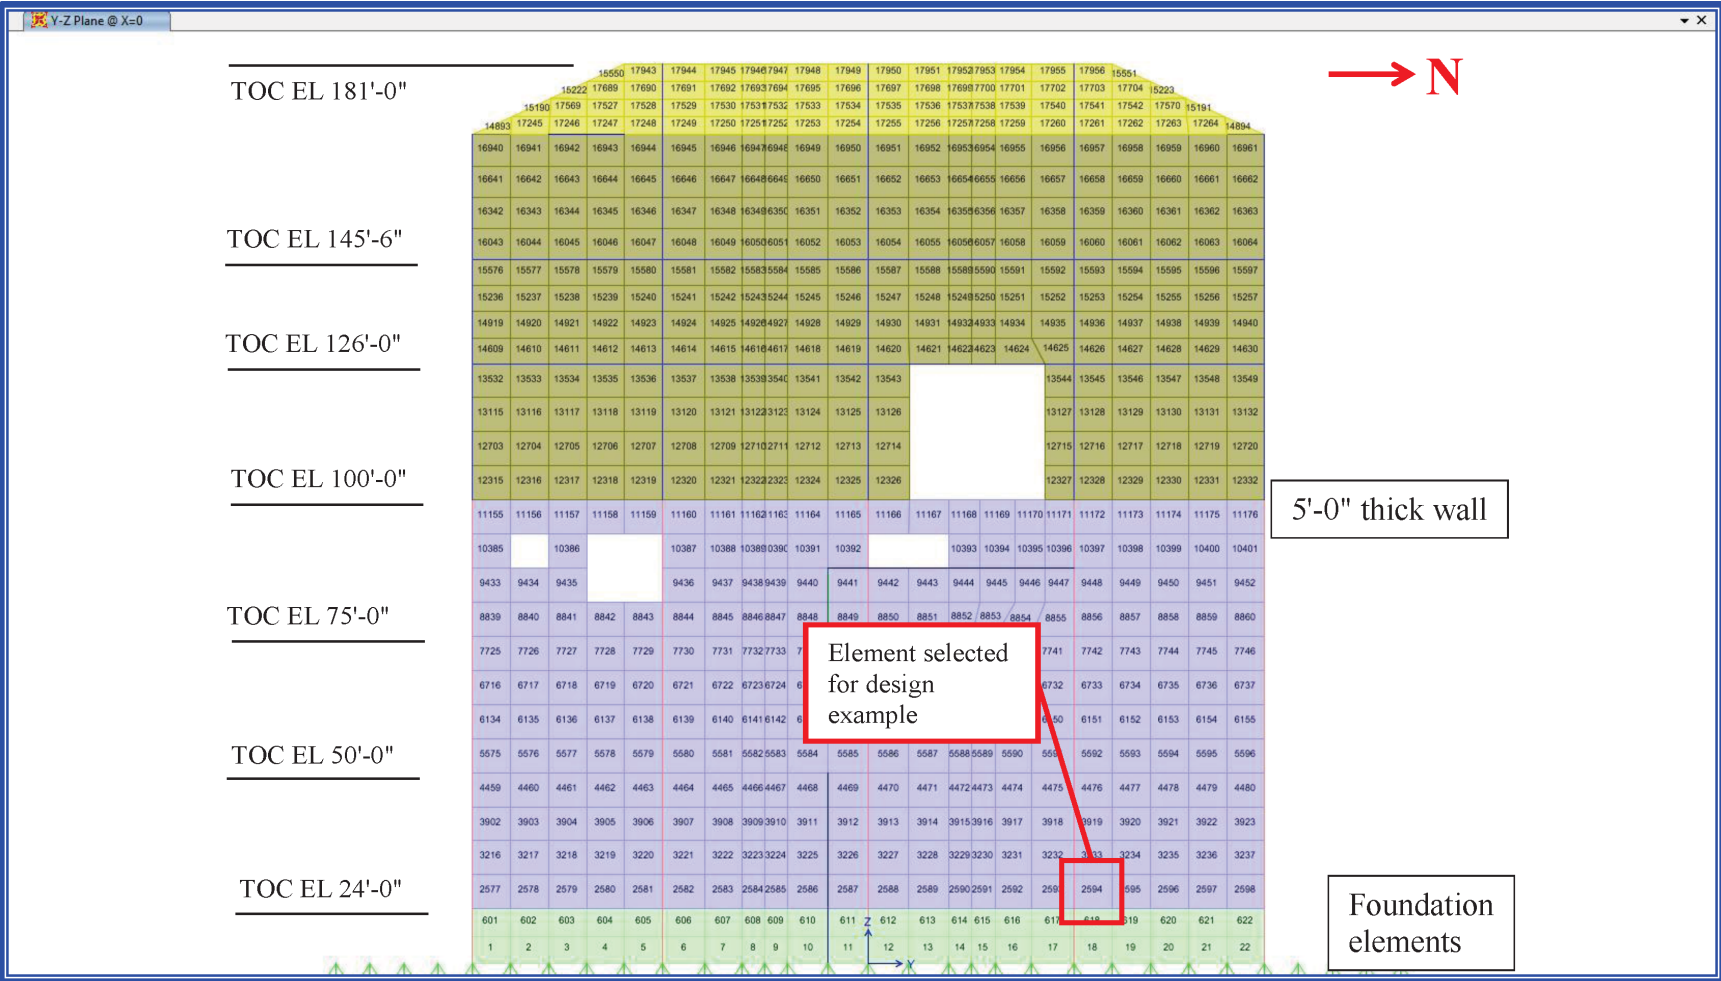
B-8: RXB Reinforcement Elevation at Grid Line 1 Wall
